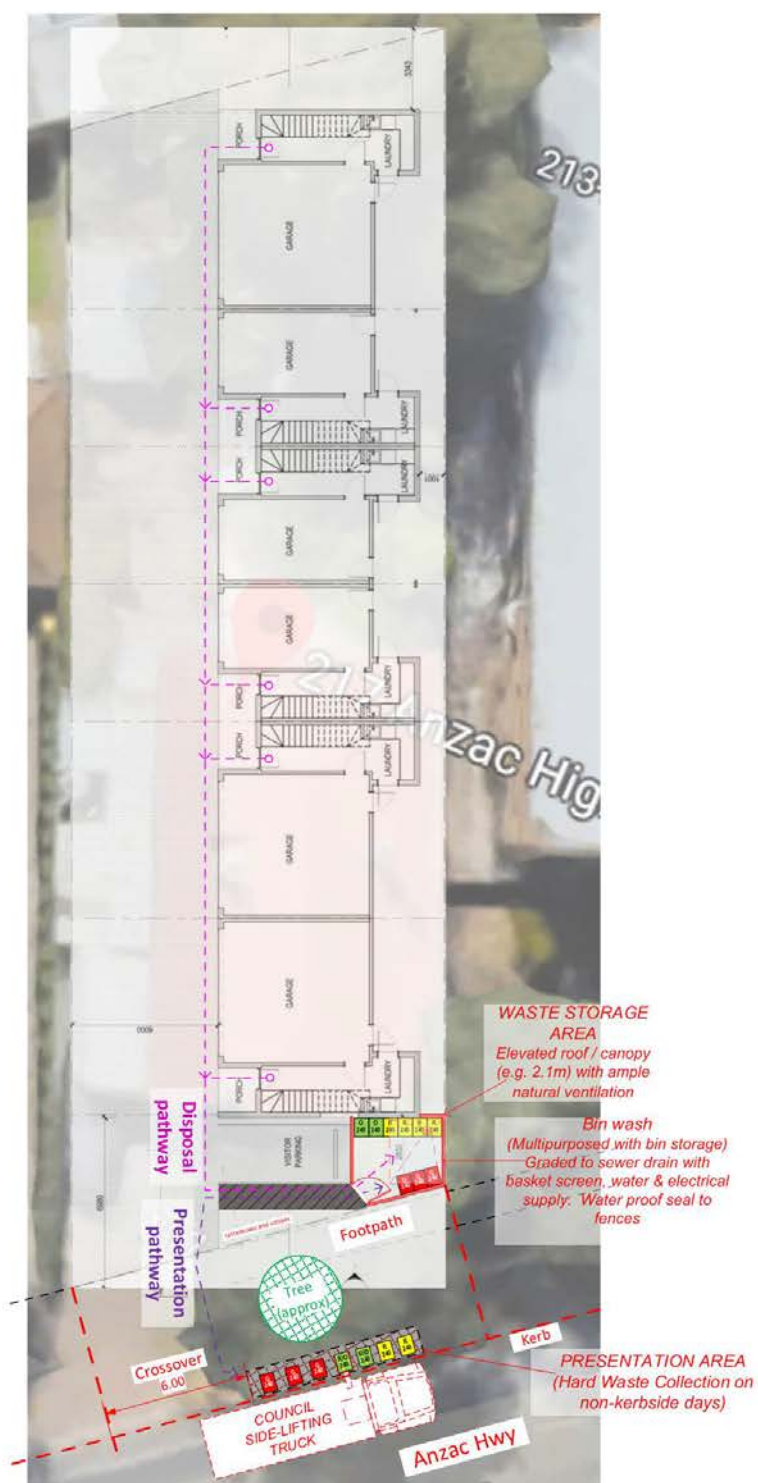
Site plan at 217 Anzac Highway showing waste storage area and presentation area
